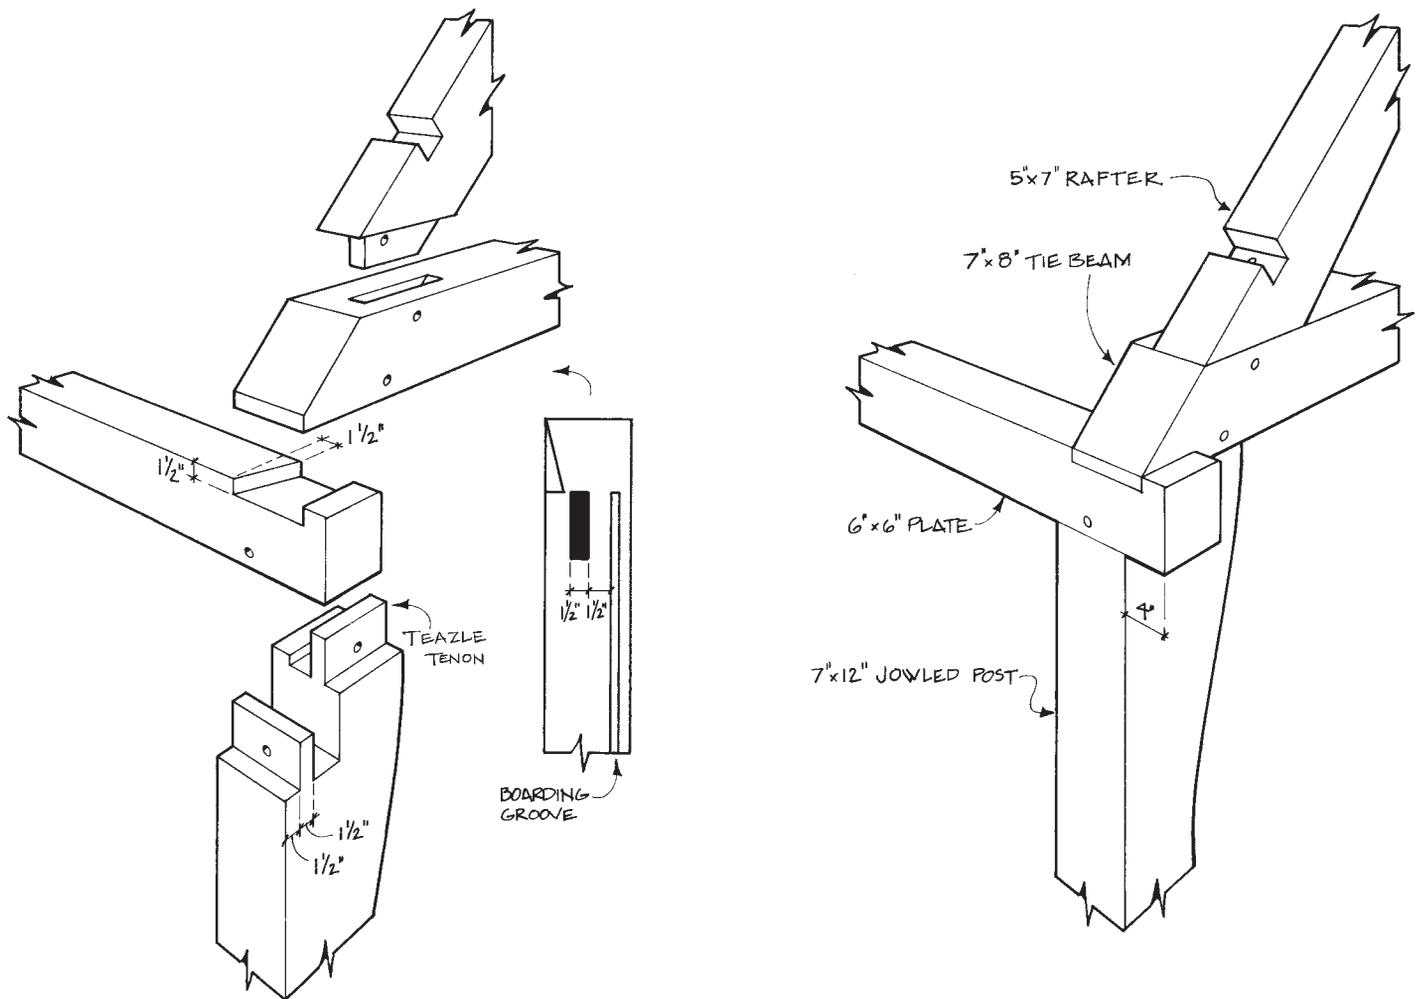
Exploded and assembled views of a gable-end English tying joint (ca. 1680).
